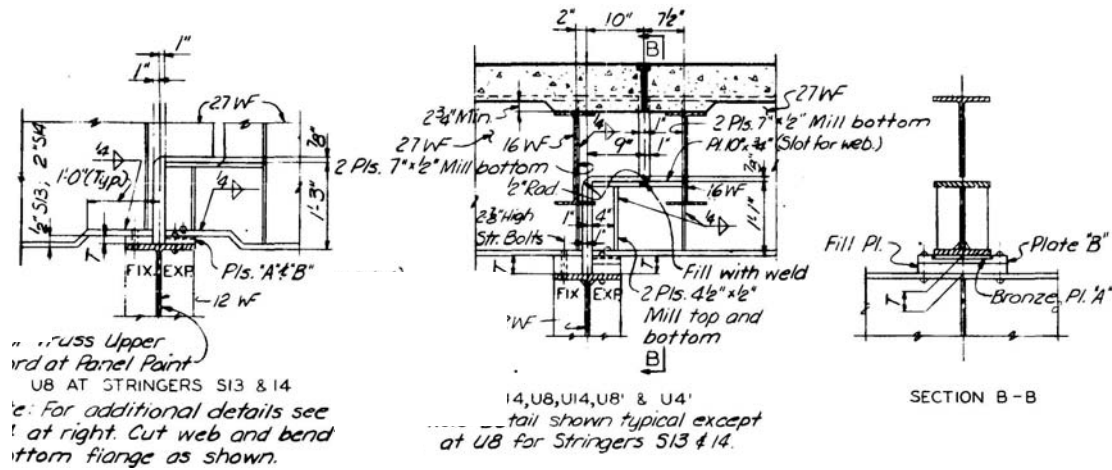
Details of stringer expansions (from Mn/DOT 2008).
